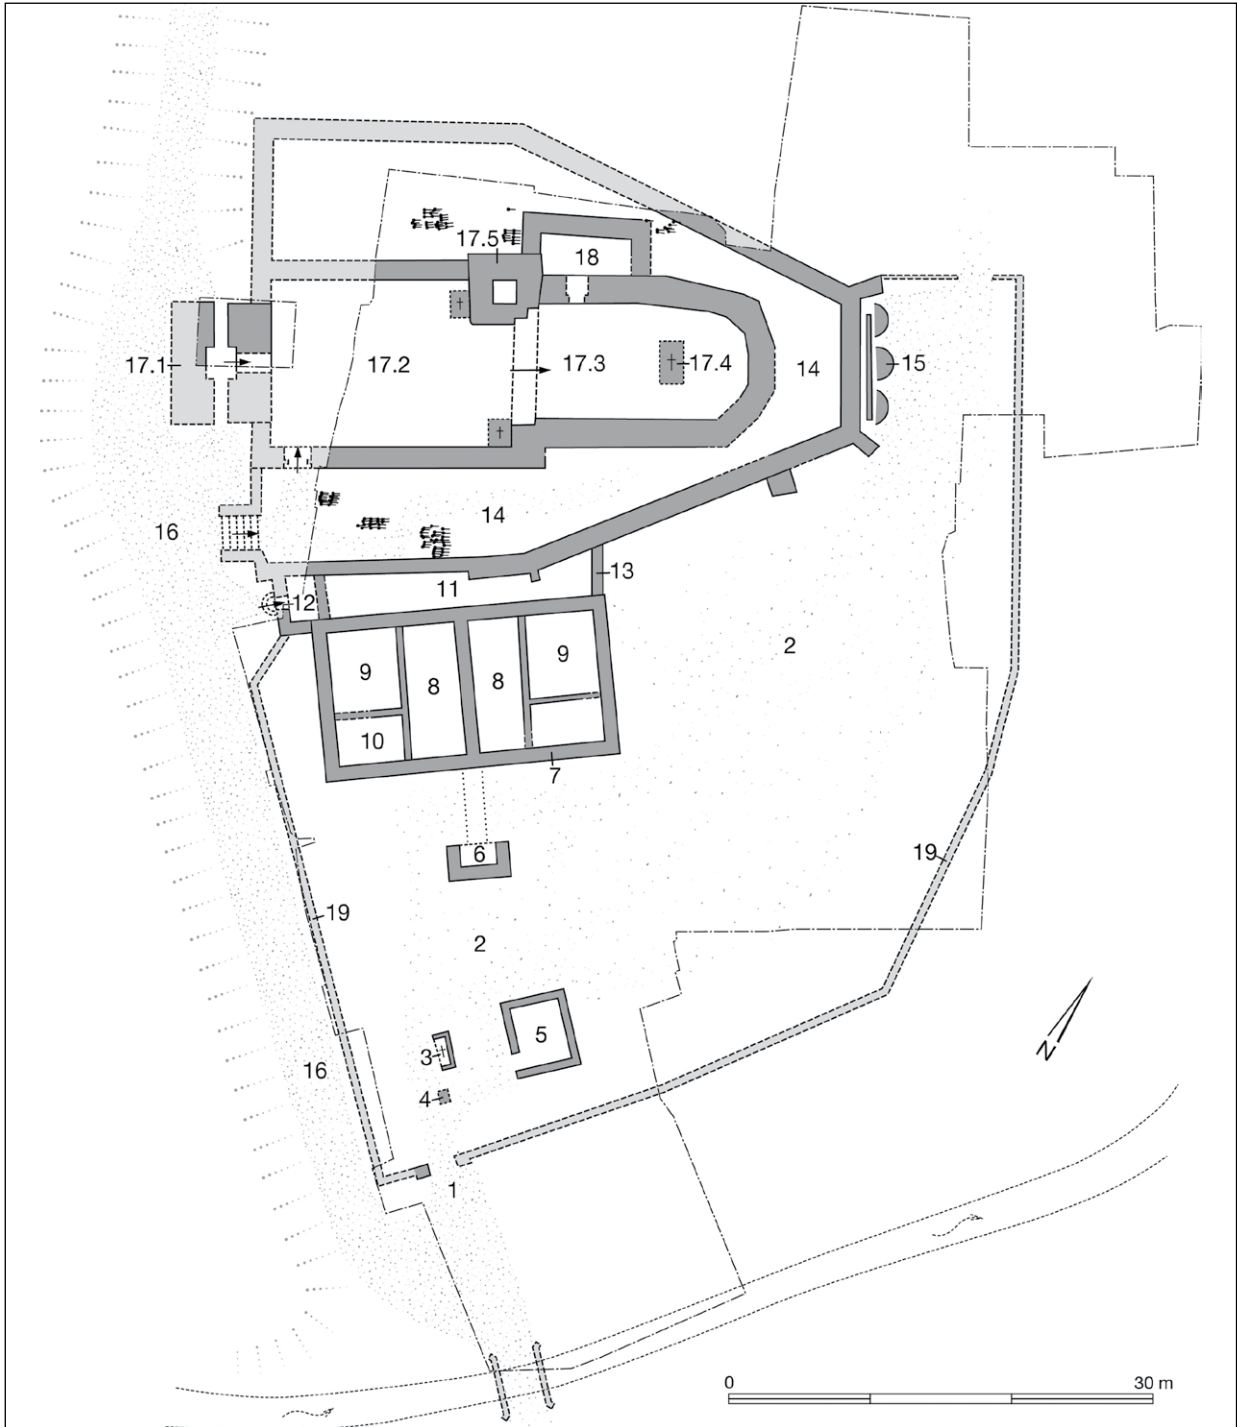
Plan of the 15th century pilgrimage buildings according to the archaeological excavation:
